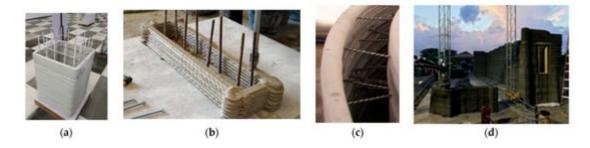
Reinforcement methods for printed concrete adopted by (a) WinSun [29], (b) CyBe [57], and (c) Apis Cor [58]. (d) Printed concrete building construction [56].
